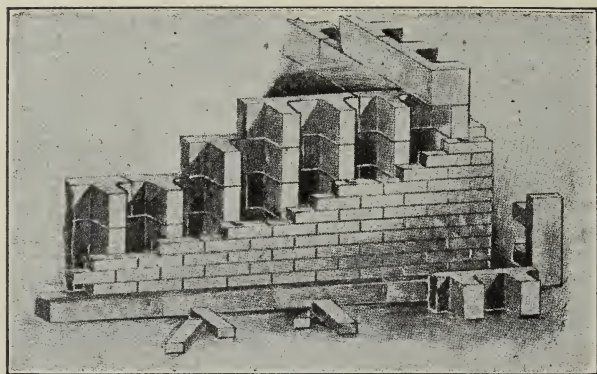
Two-piece Concrete Blocks Used as Backing for Brick-veneered Wall.
